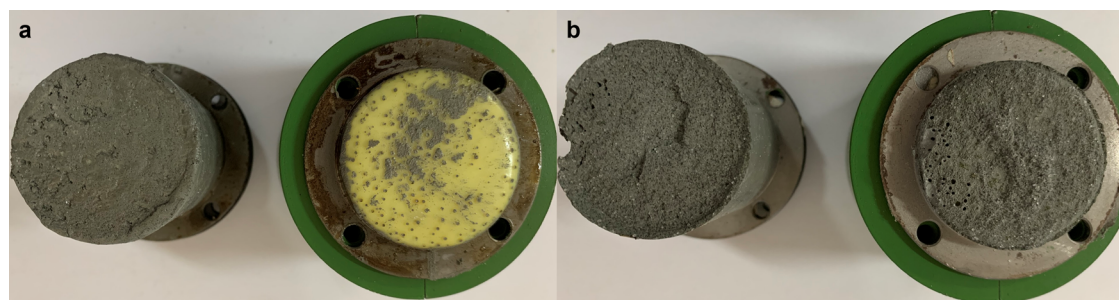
Fracture surfaces of bonding test specimens before (a) and after (b) the introduction of the transition layers.
